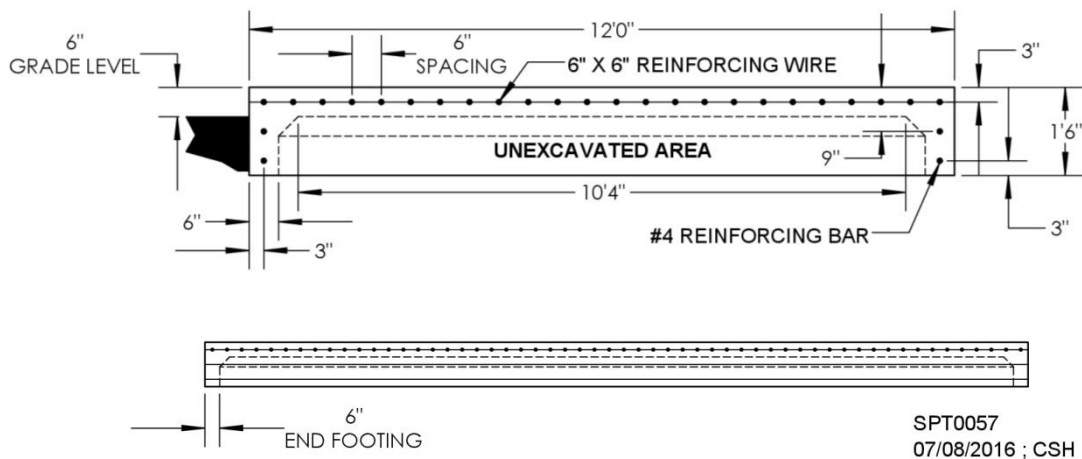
Foundation specifications for single-module dryer (requirements may vary due to site elevations)
